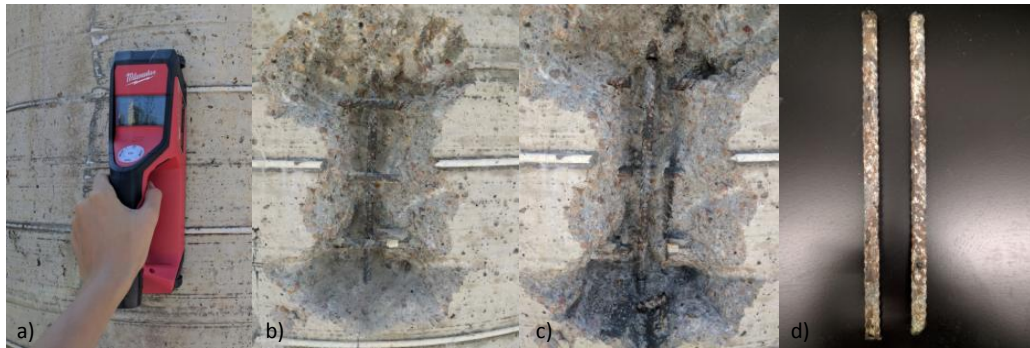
(a) rebar detection (b) removing concrete cover (c) cutting rebar from the cask (d) corroded rebar
